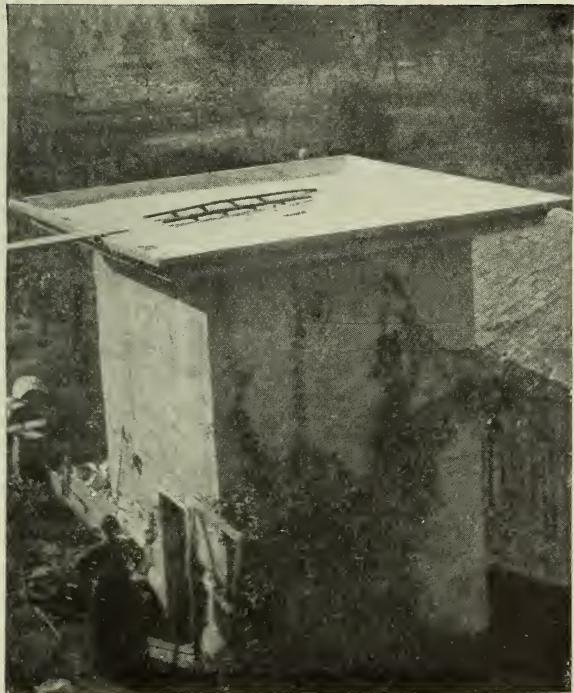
Concrete Dairy House and Water Tank of Joseph E. Wing, Mechanicsburg, Ohio, showing the flat slab concrete roof with ornamental cornice.
